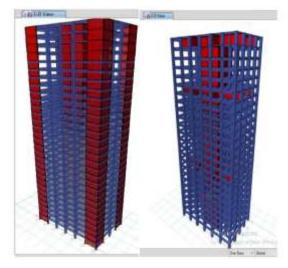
Shear Wall System 25 Floors & Outrigger System 25 Floors
